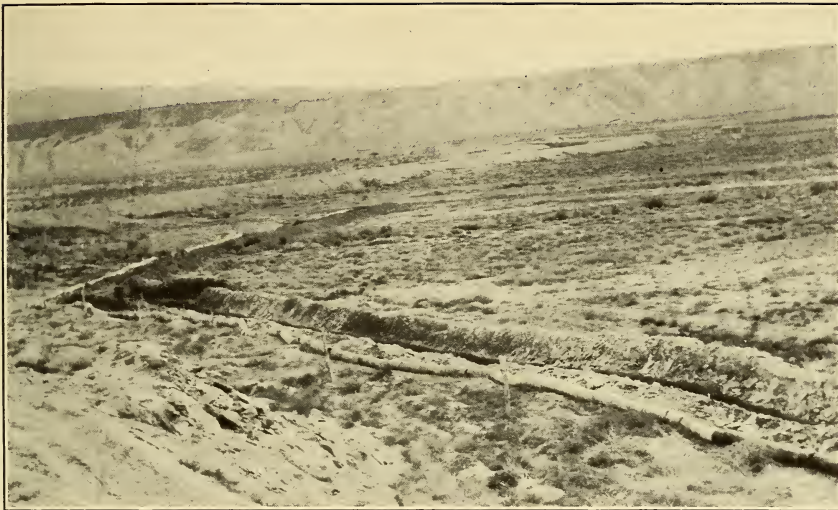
View from upper end of site of experimental drain at Montrose, Colo., showing the opened ditch and the distribution of the tiles just previous to placing. Observe hard shale excavated at upper end to the right in picture
